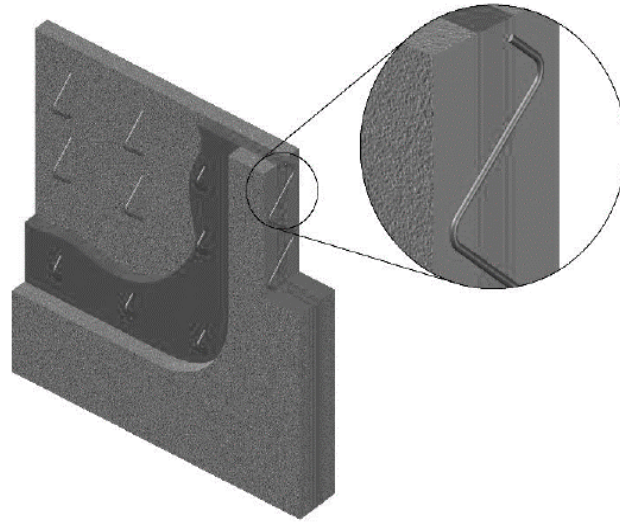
Concrete Sandwich Panel Wall ((Olsen et al., 2017)
